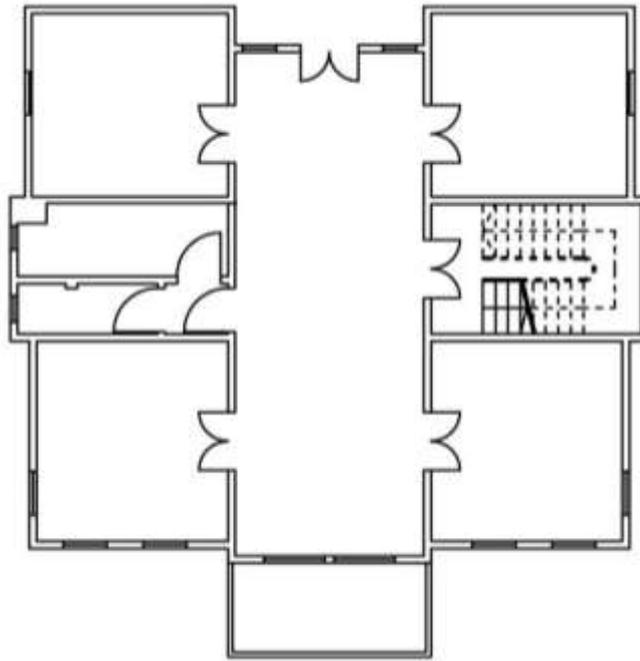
The entrance floor plan of the house at 166 lot 5 parcel
